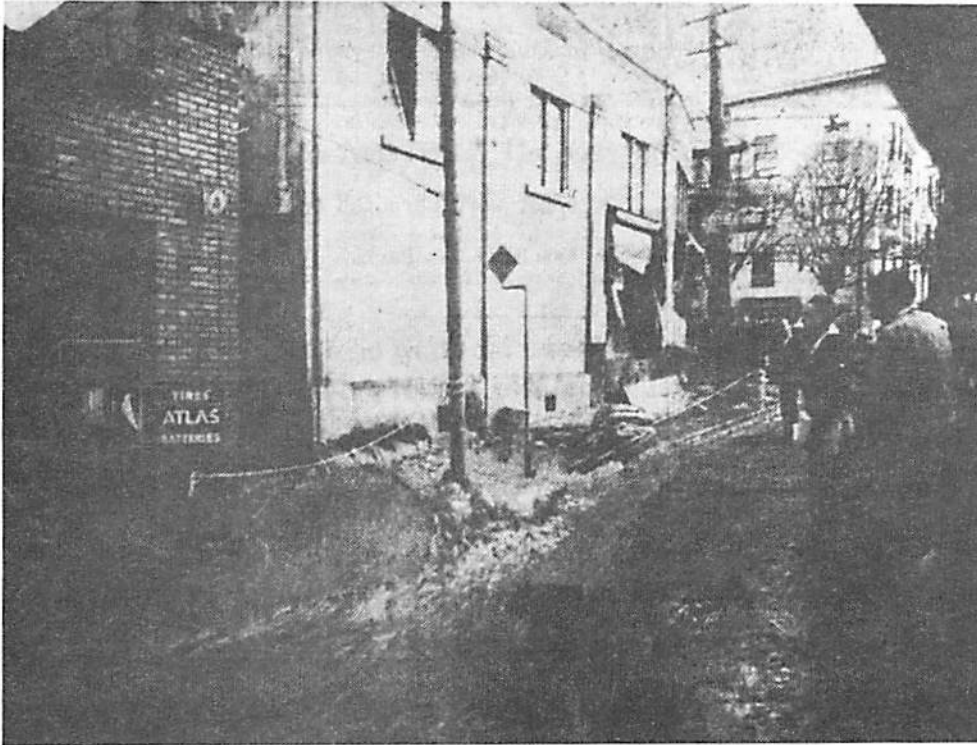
Strawberry Creek pours out of a building in which a culvert exploded.
